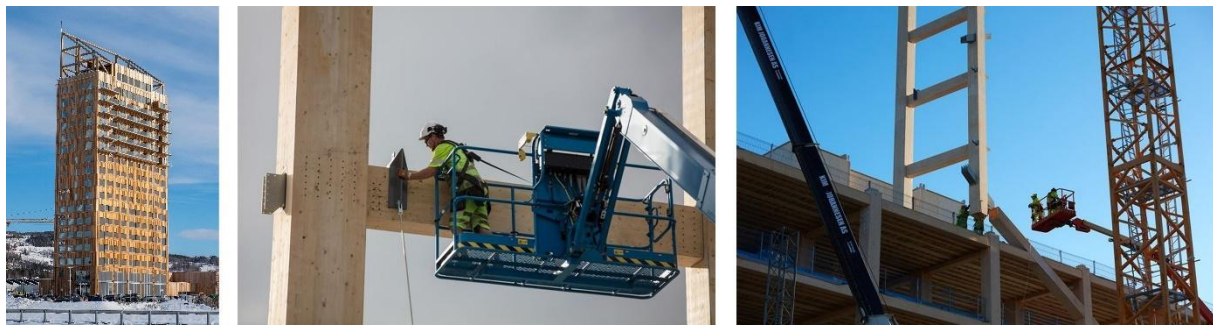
Mjøsa Tower (“World's Tallest Timber Tower to Be Built in Norway—Thanks to New Rules on What Defines a "Timber Building"”, 2025; “World’s tallest wooden building. Mjøsa Tower by Voll Arkitekter”, 2025)
